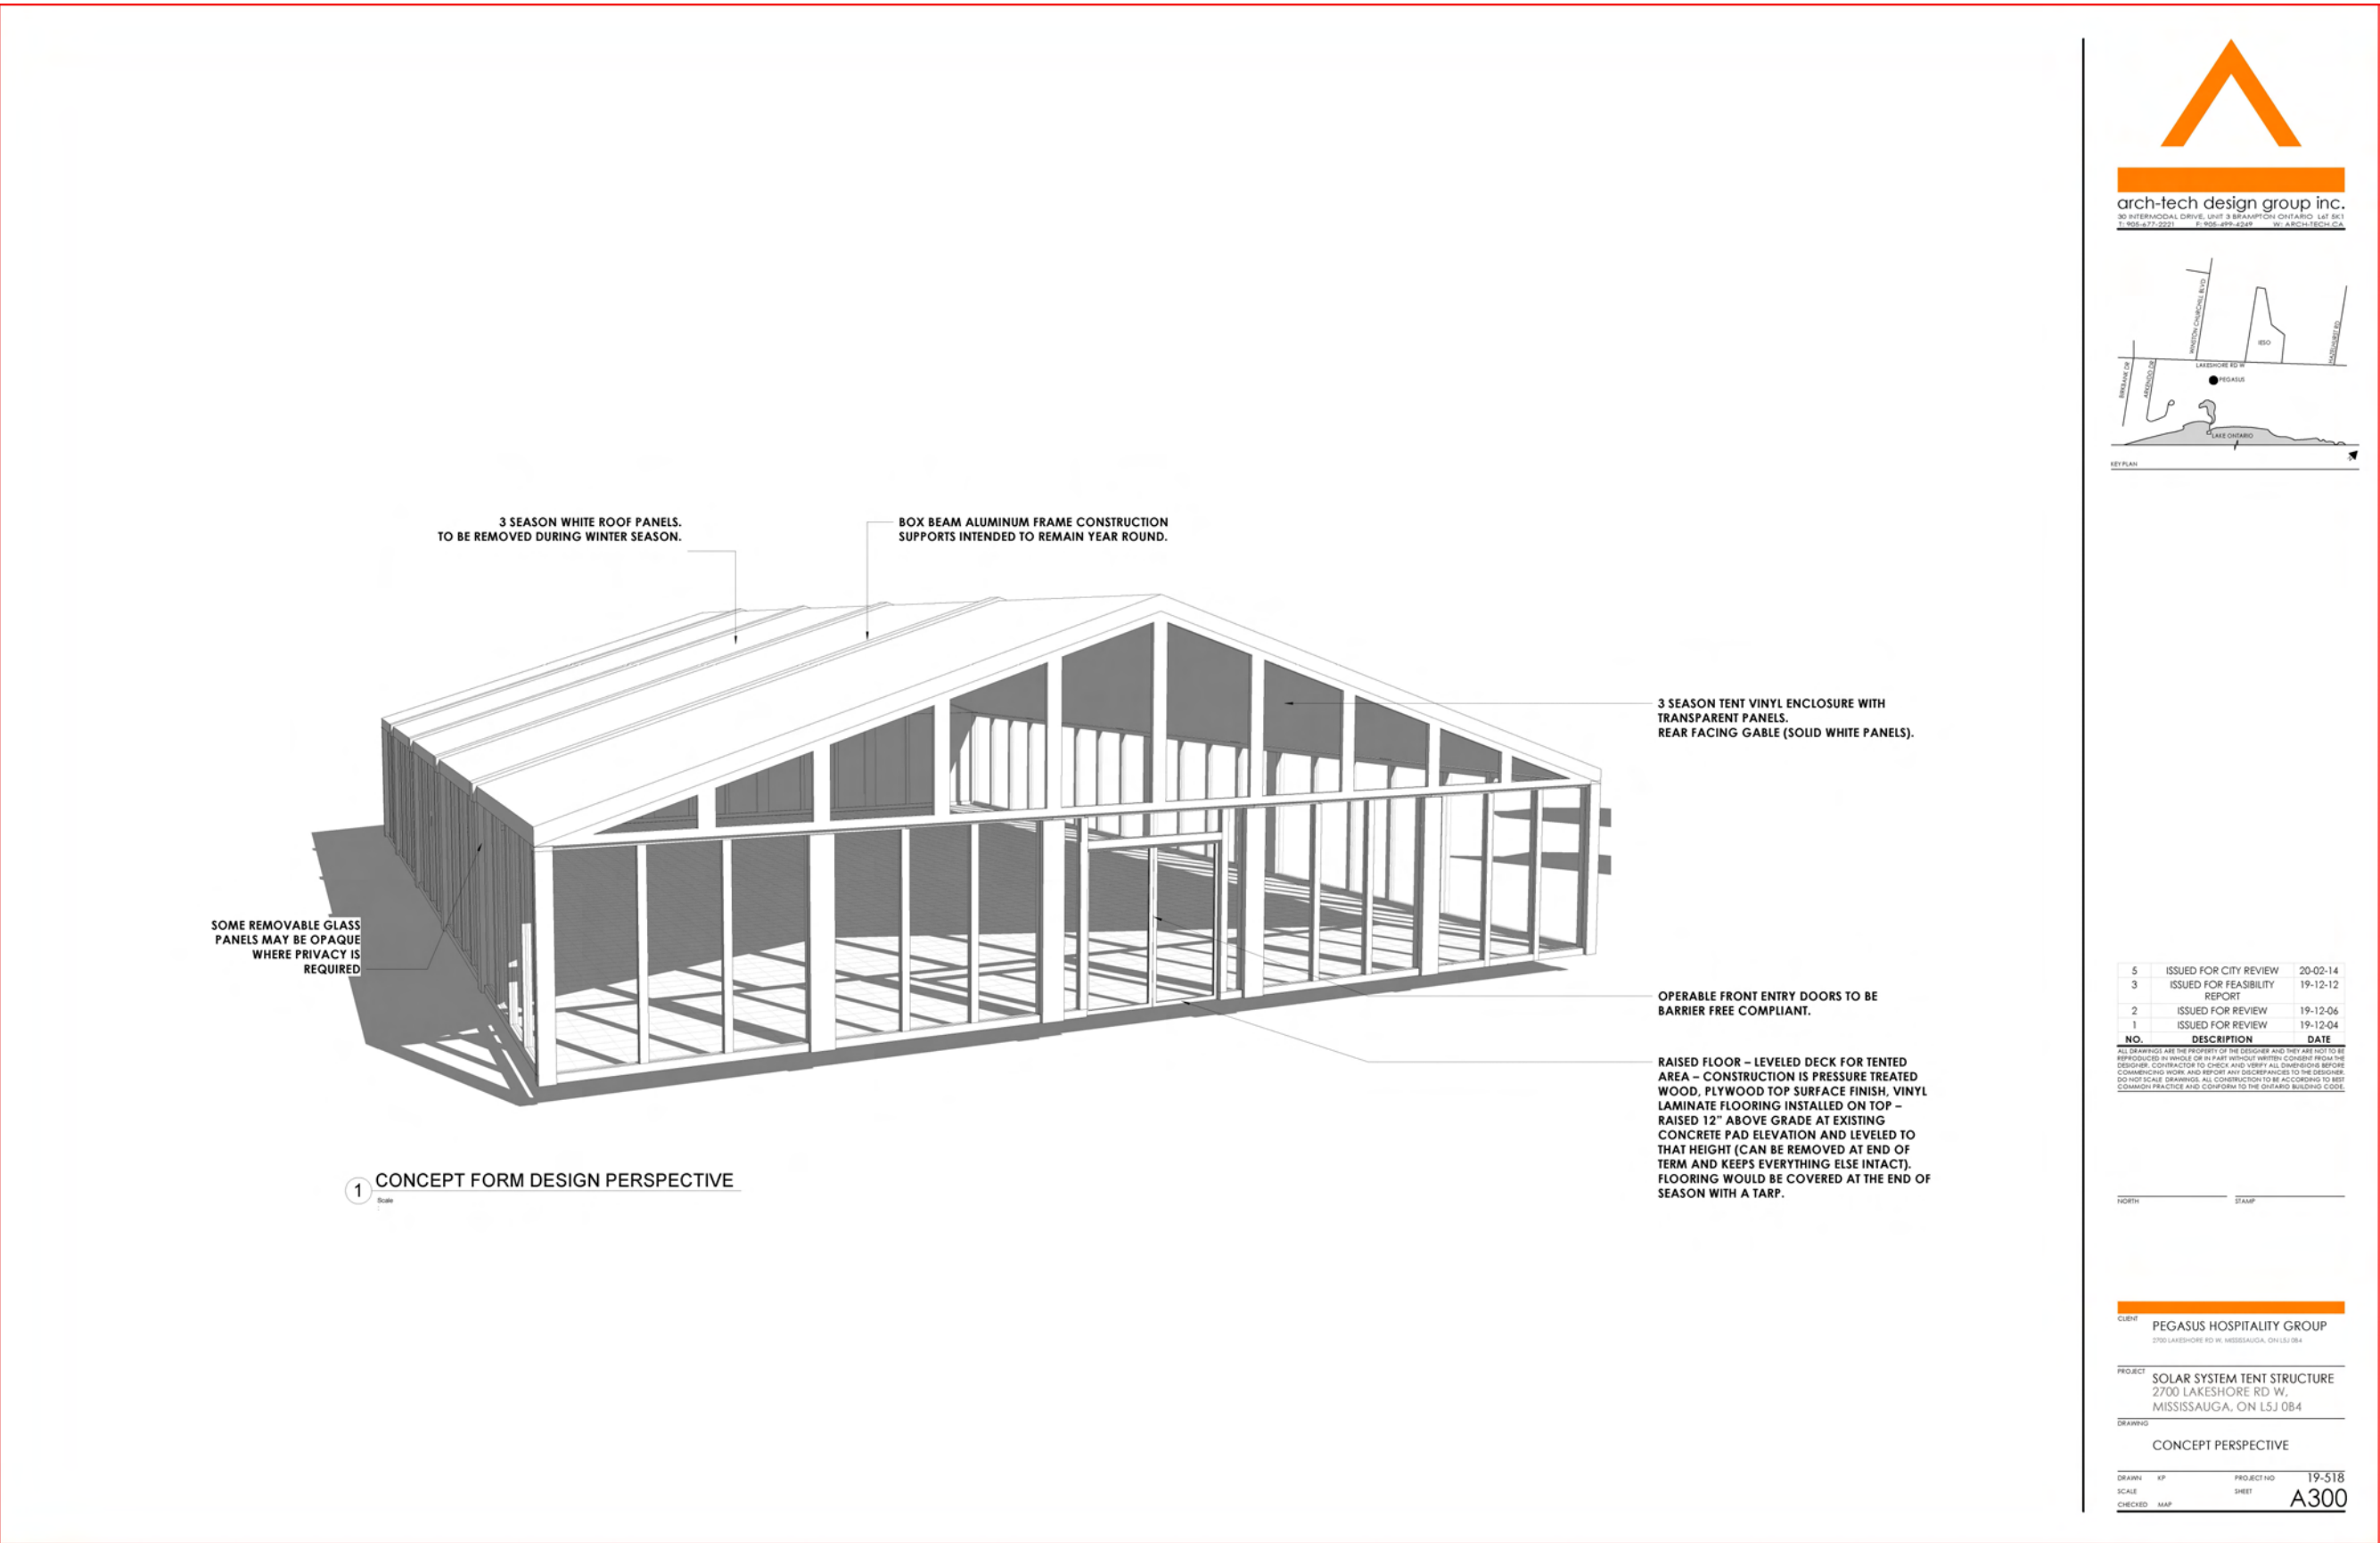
Conceptual perspective of proposed solar system tent structure, 14 Feb. 2020.
